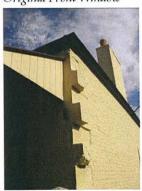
The corner showing toothed sandstone faithfully reconstructed.
